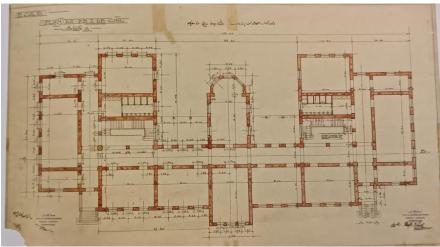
Ground Floor Plan of the School for the Dumb and Blind [39].
